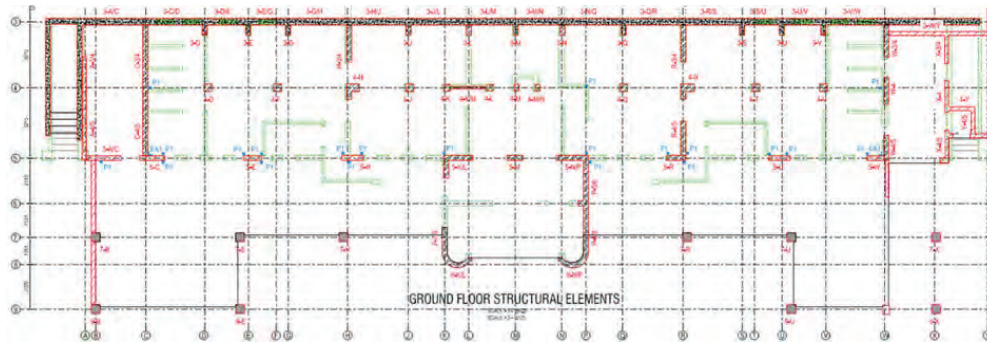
Plan Showing Original Brick walls remaining with black brick hatch and original brick walls removed in green. For clarity see SK01 in Appendix.
